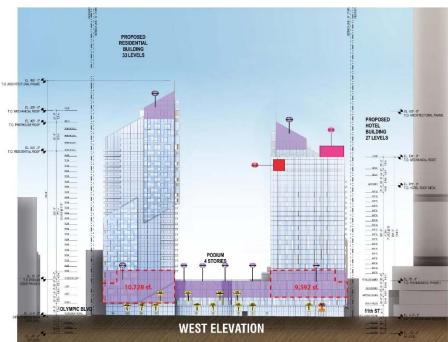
Alternative B Sign Dimensions and Locations – West Elevation
